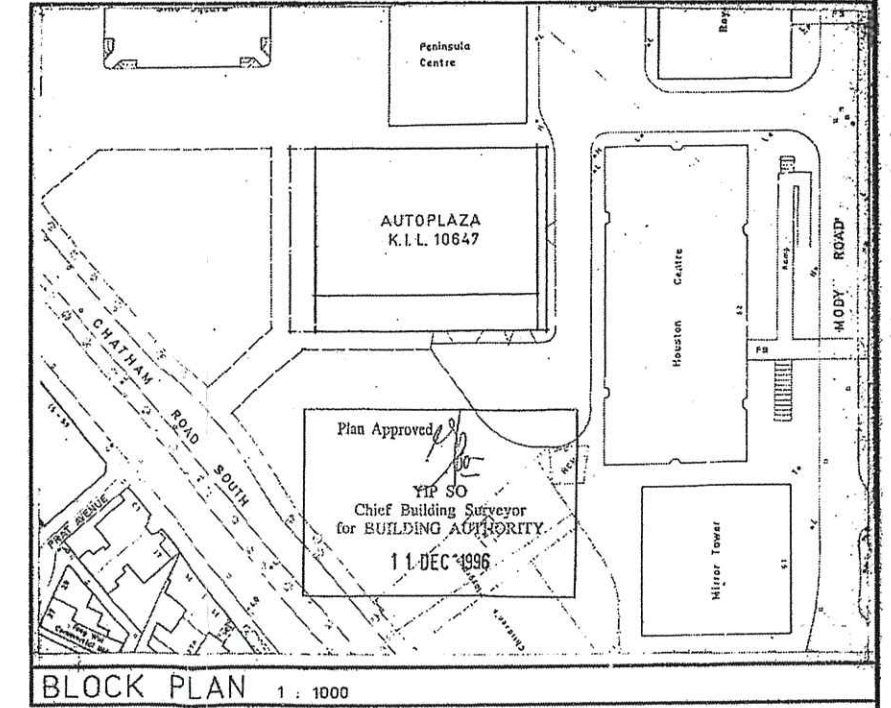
FIGURES QUOTED FROM APPROVED GENERAL BUILDING PLAN
